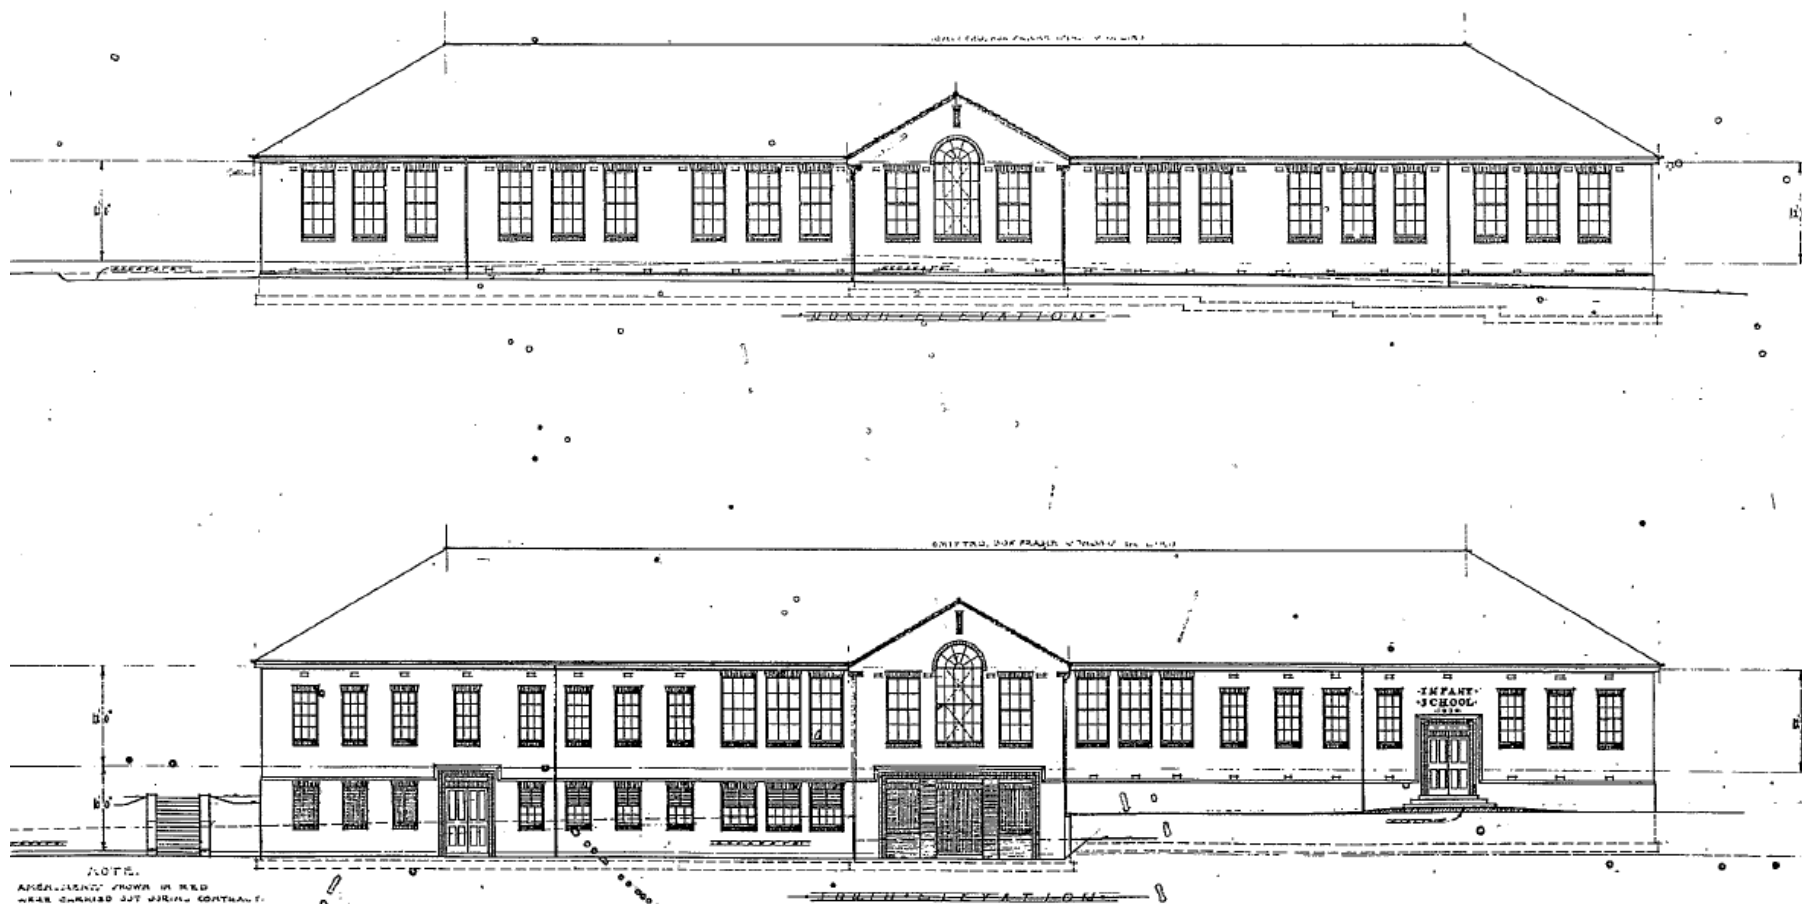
1930 North and South Elevations of the Infants School building.
